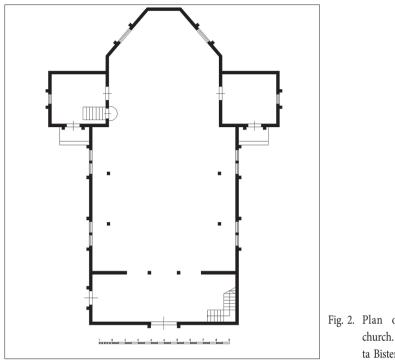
Plan of the Stolerova church. Drawing by Gunta Bistere, 2009
